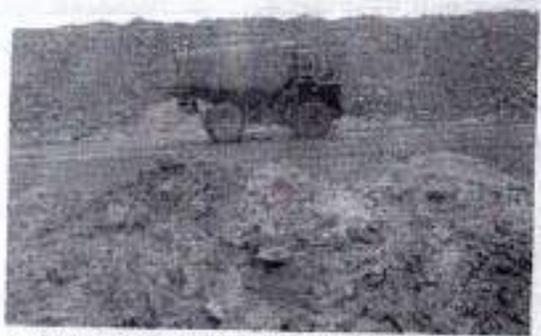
Photo of Water tanker sprinkling water on mine roads.
